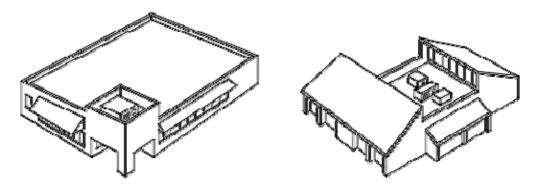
(E). Screening examples of rooftop mechanical equipment.
